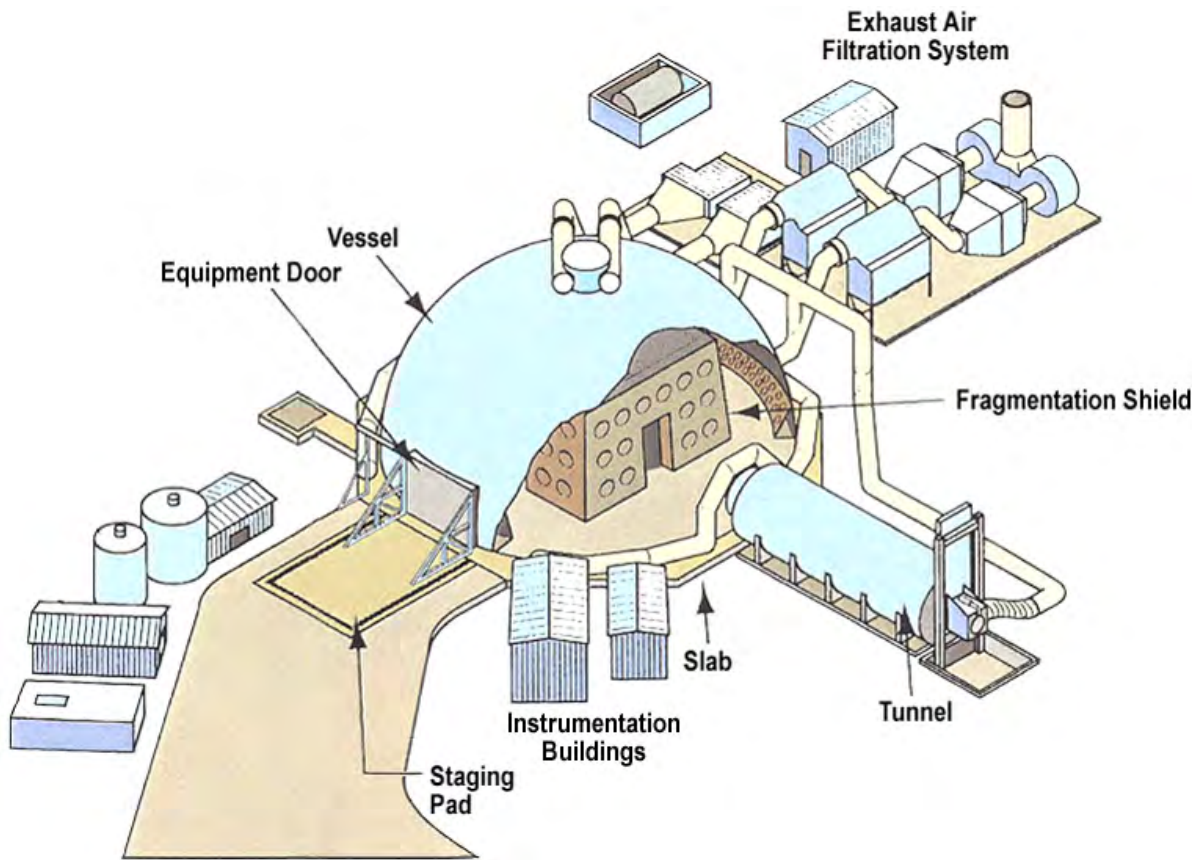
Exterior Plan of the Superbox and Auxiliary Buildings
